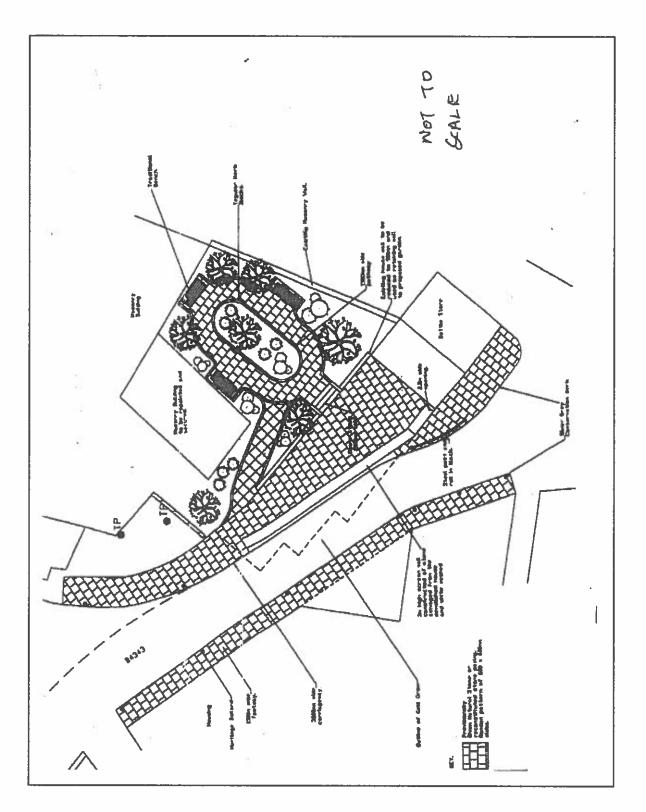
Architects plan showing development proposal of landscaped area once Gelli-Gron is demolished. Note position of new boundary wall (Plan supplied by Ceredigion County Council)
